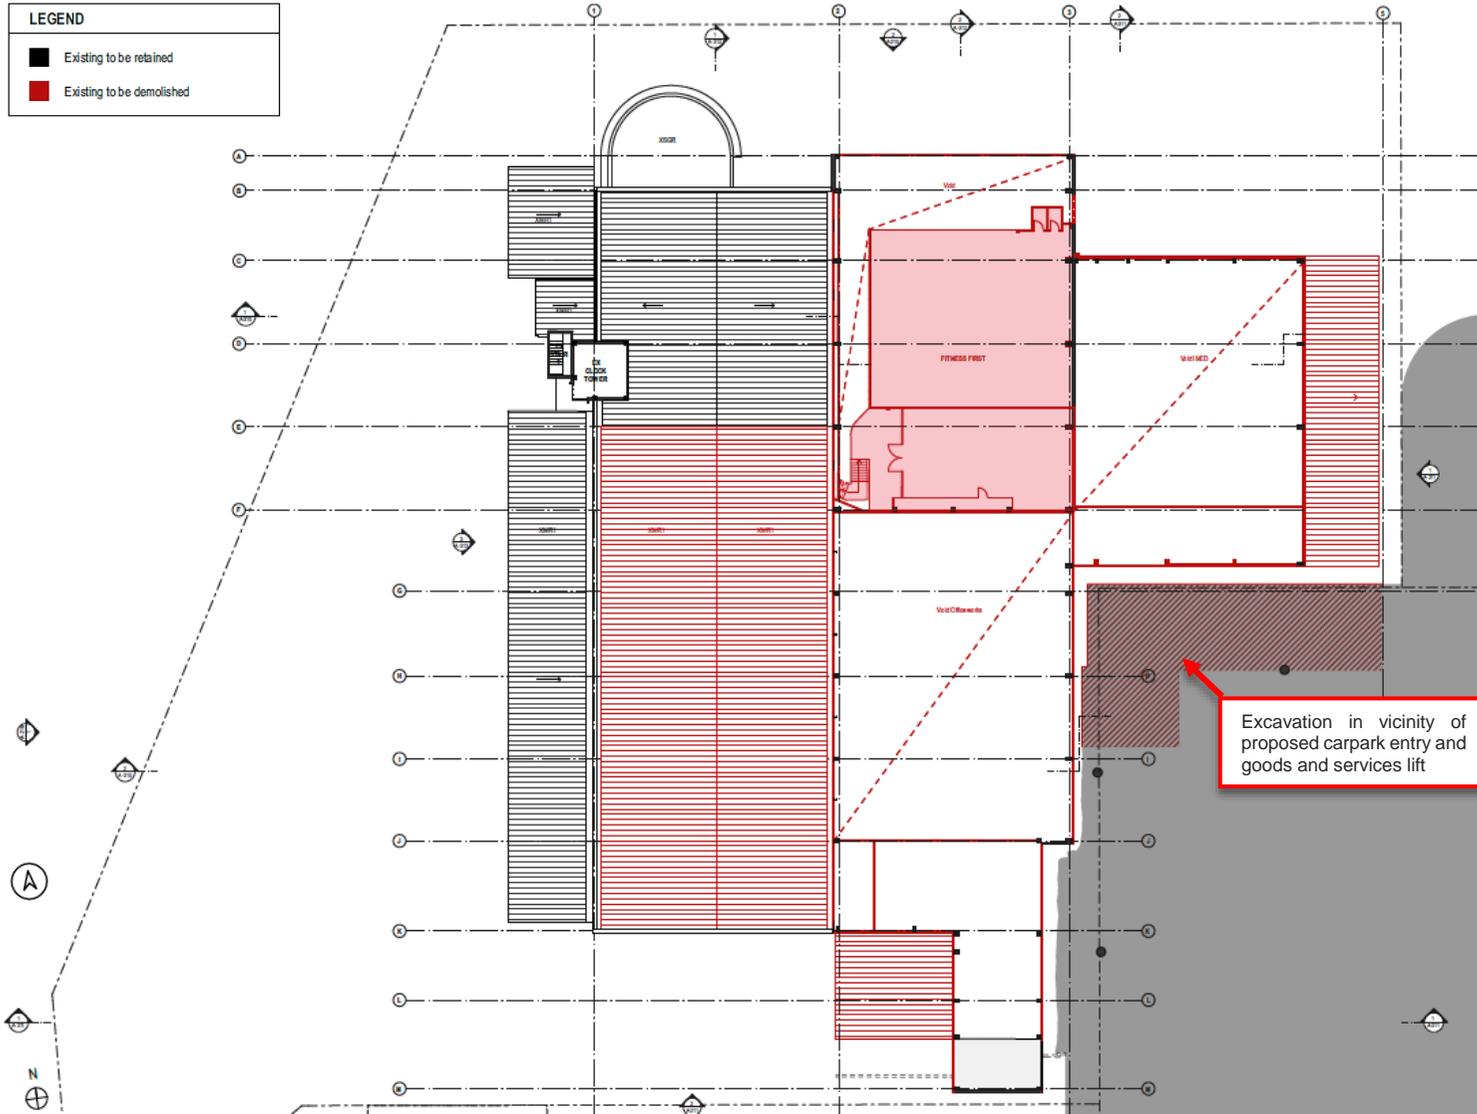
Extent of proposed excavations at Level 3, 800 Pittwater Road (Source: Level 3 Demolition Plan\_800, A-033, Rev A, 29/10/2019, Tonkin Zulaikha Greer Architects)
